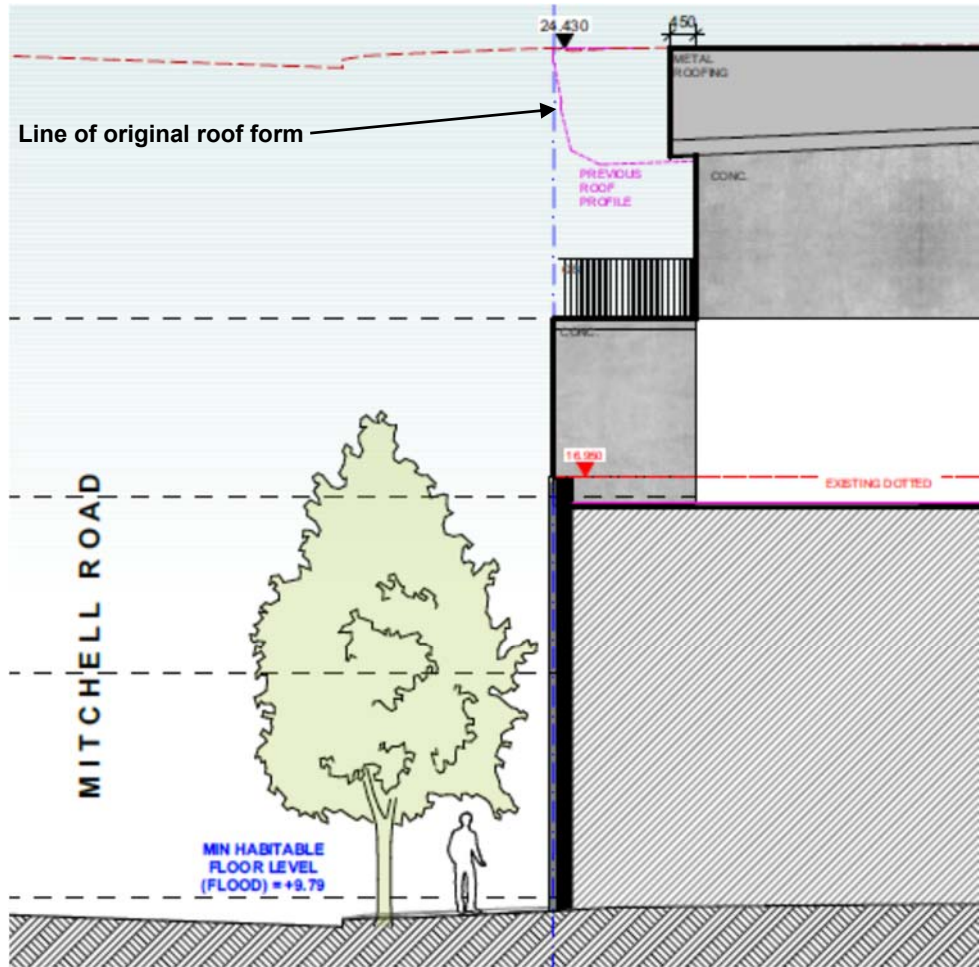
Partial southern elevation illustrating the scaled back roof form to ensure a more harmonious fit within the heritage conservation area
